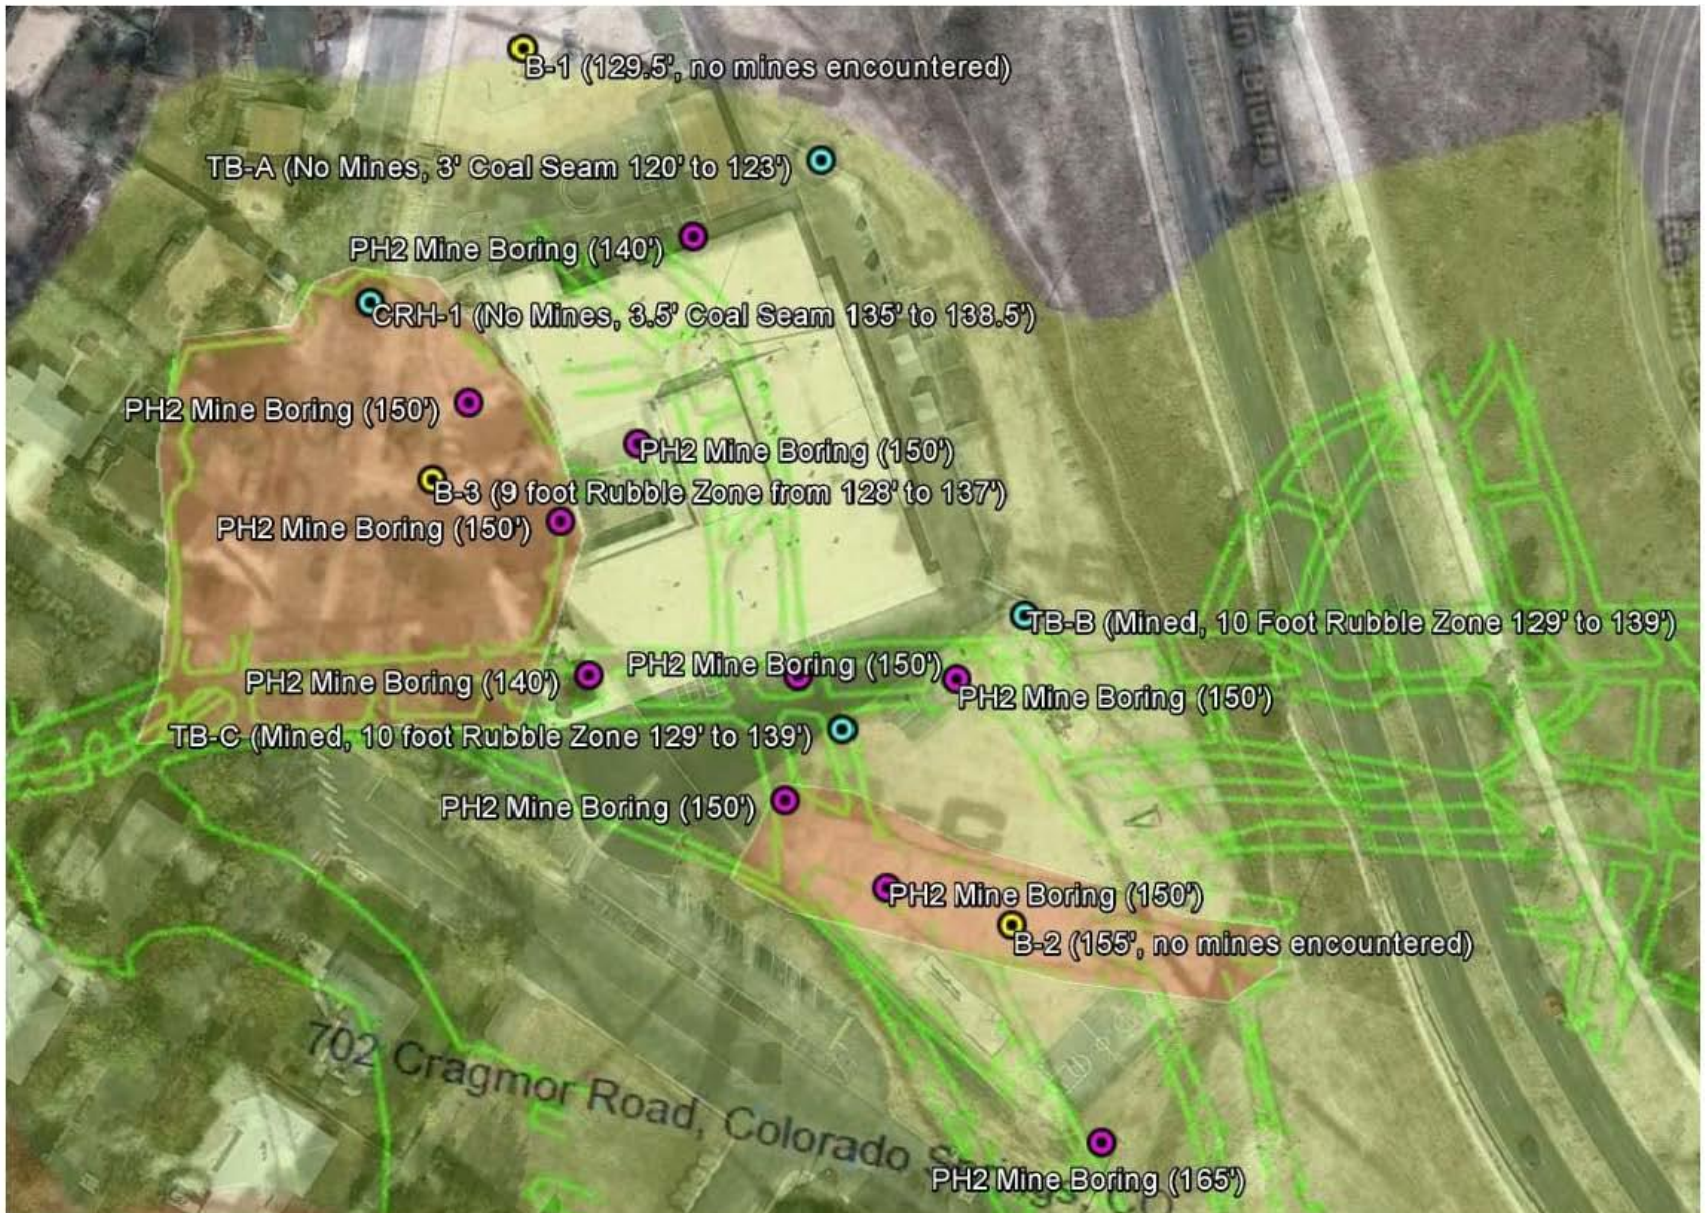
, Existing and Proposed Borings with Mine Map Overlay
